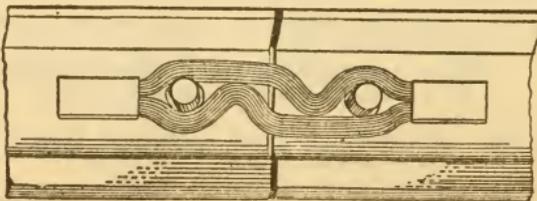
Soldered Bond Applied inside of Angle Bar.
